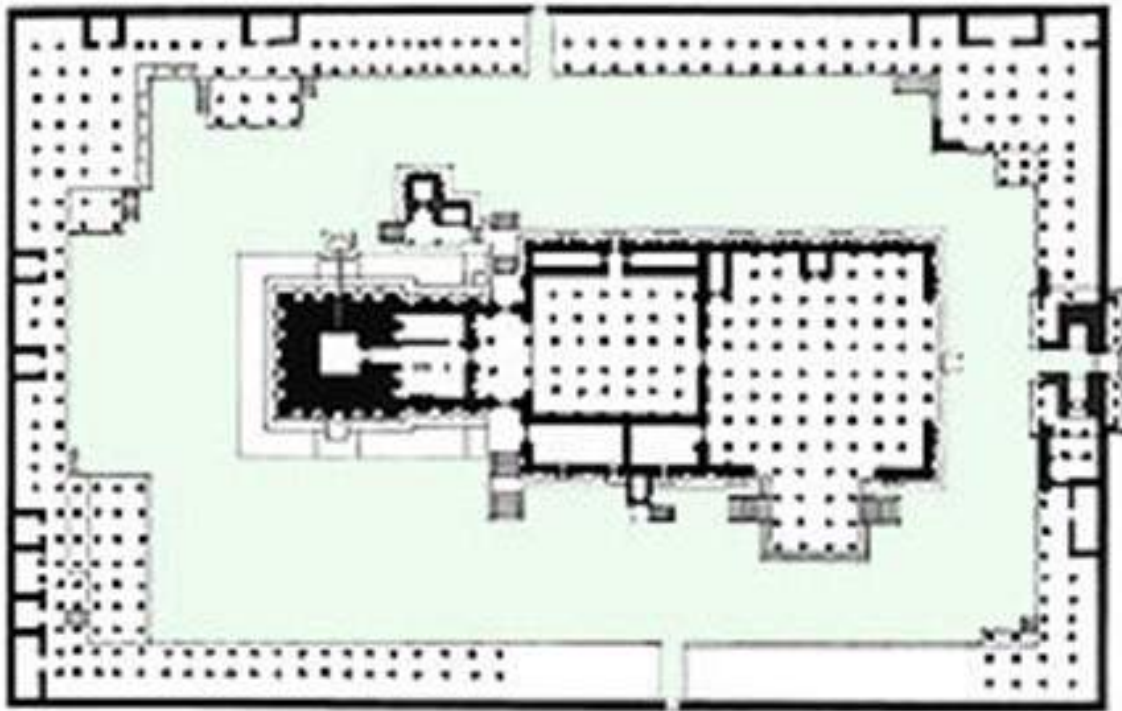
Airavateswara Temple, Darasuram Ground Plan
